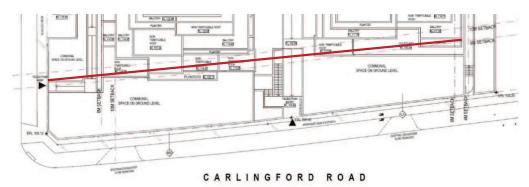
Proposed setback to Carlingford Road Source: SWA Group
